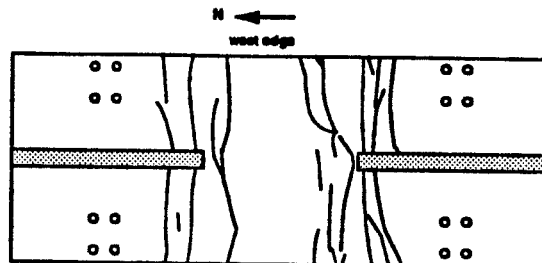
Sp.2a: Progression of Cracking of Bottom Face of Second Floor Slab at End of Test
